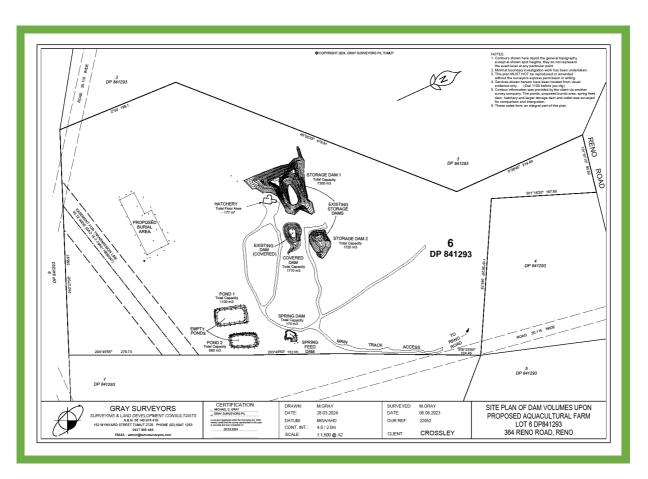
Site Plan showing Volumes of Dams and Ponds.
